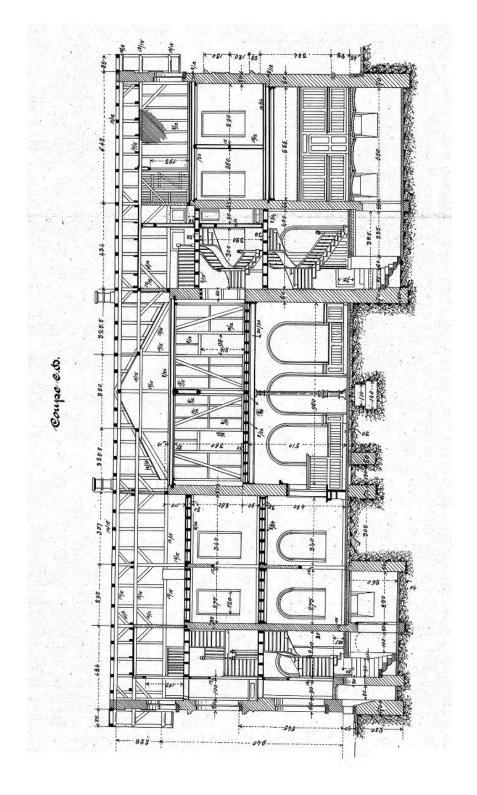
Ist class station building project drawn for Konya / Longitudinal Section
